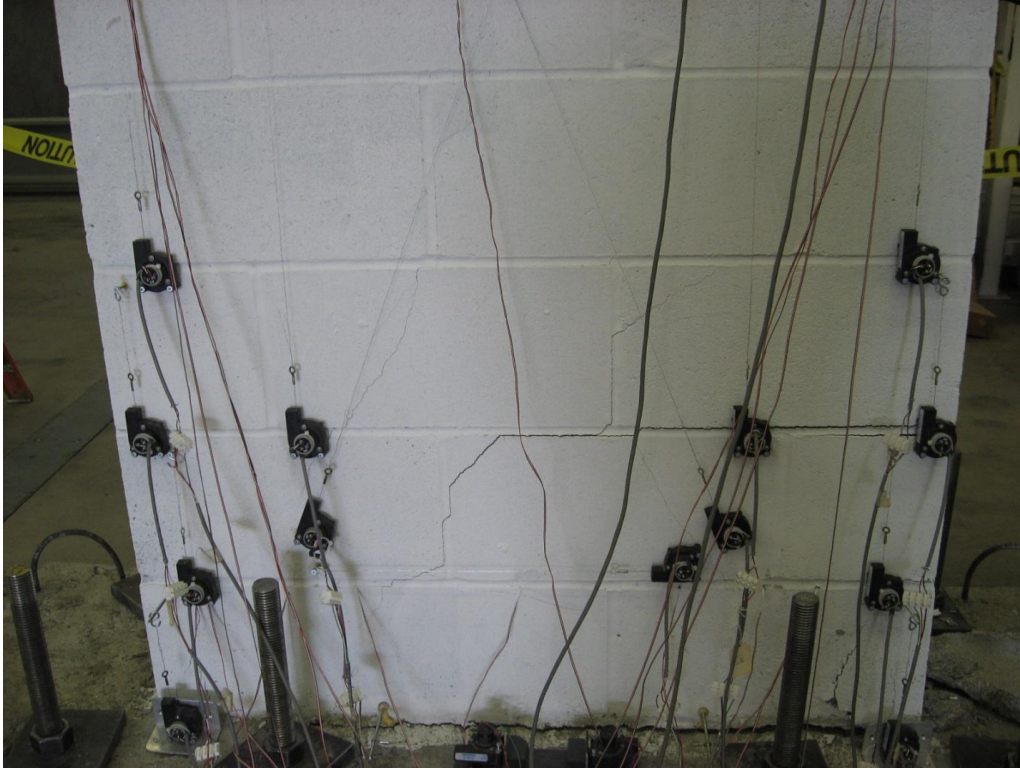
Wall C2: Further Development of Flexural Cracks Along with Some Shear Cracks
